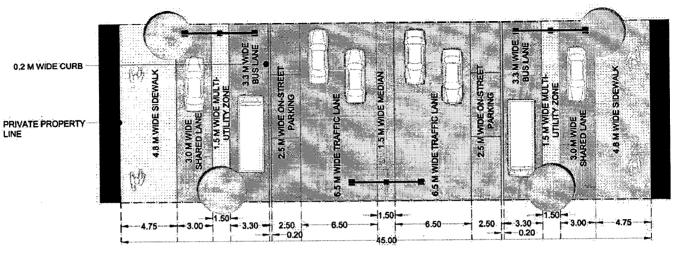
Detail for 45m wide Street (alternate 2)
